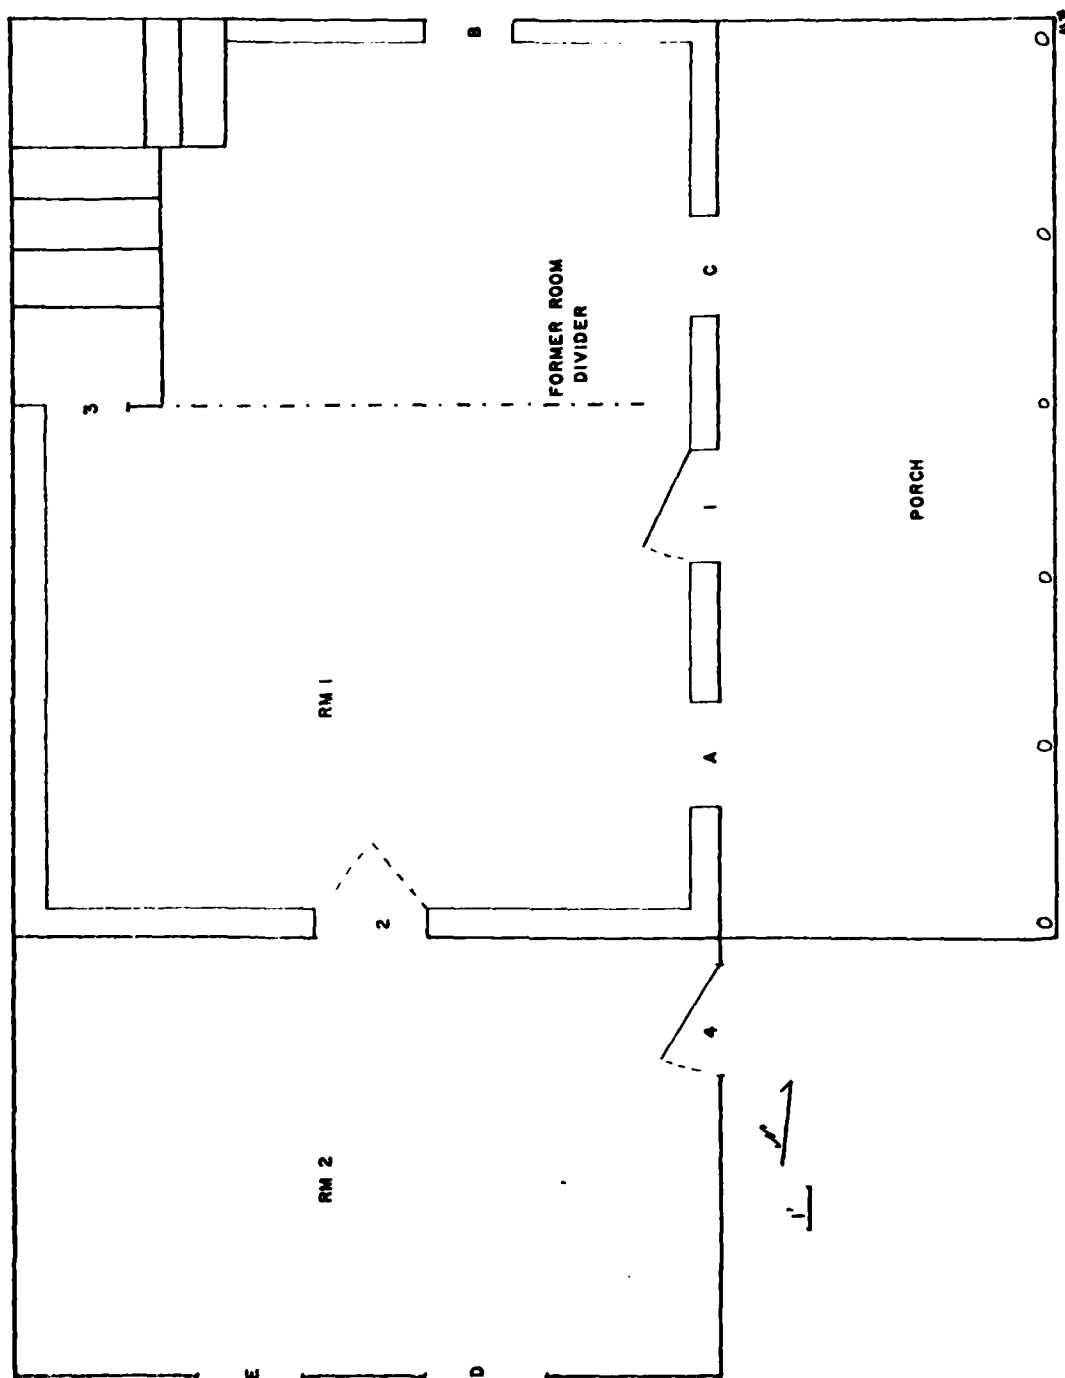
Floor plan of lower storey (Rooms 1 and 2) of dwelling on Tract 102. Note former room divider.
